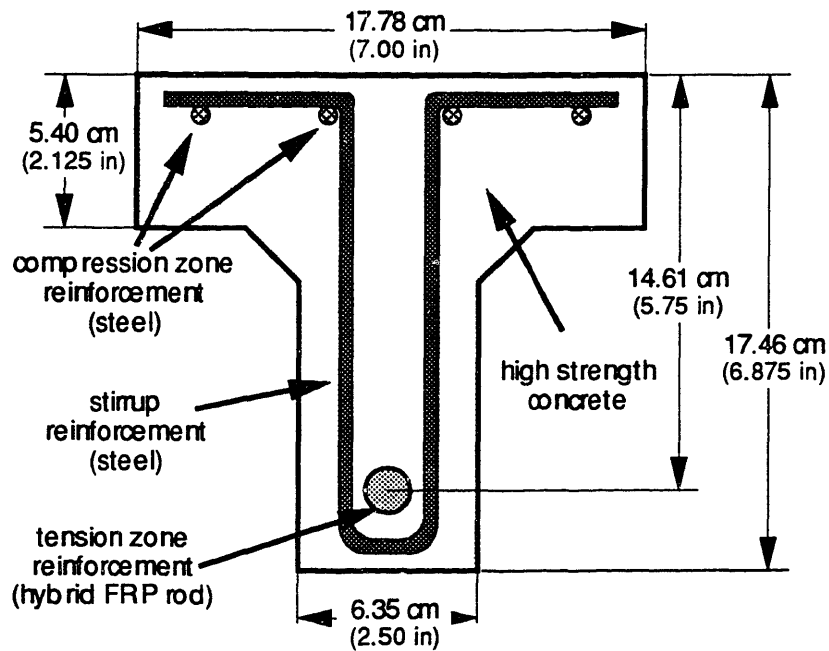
Hybrid FRP Test Beam Cross-Section (Phase II)
